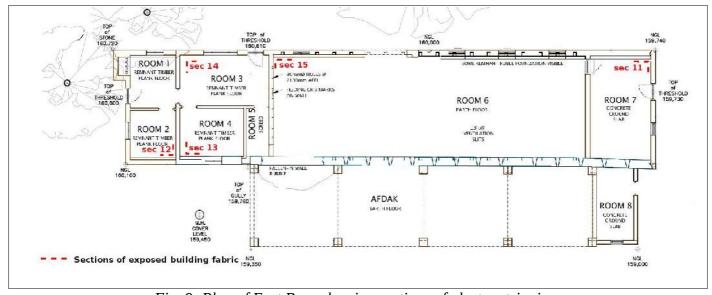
Plan of East Barn showing sections of plaster stripping.
